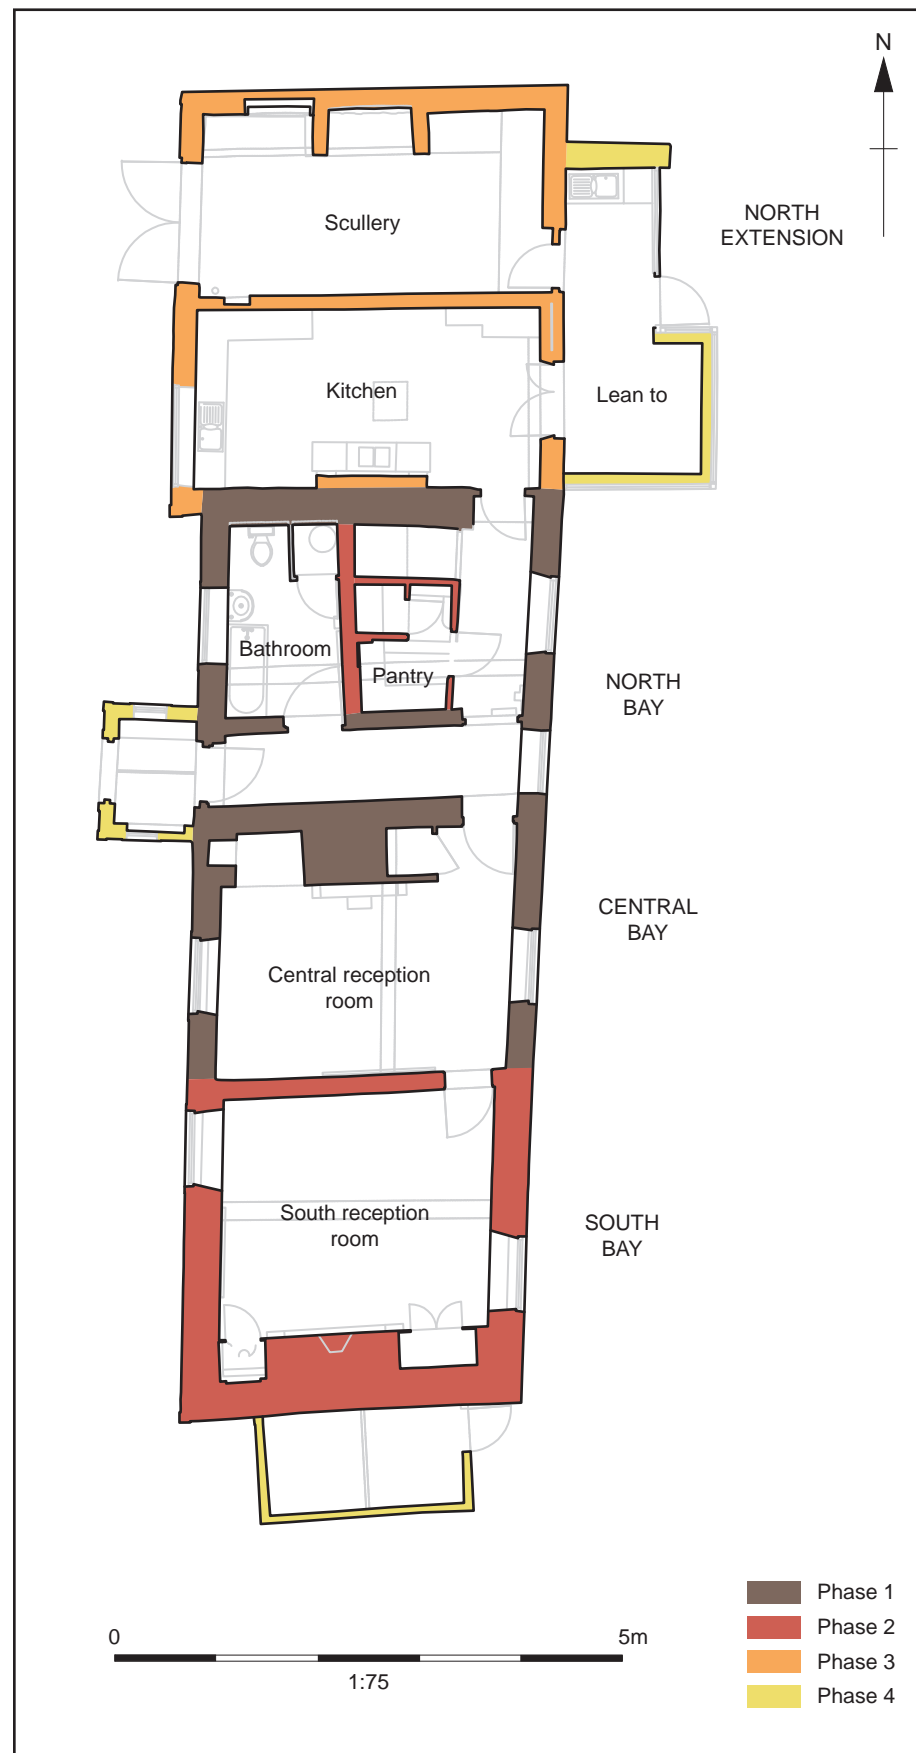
Phased ground floor plan of Shepperdine farmhouse
